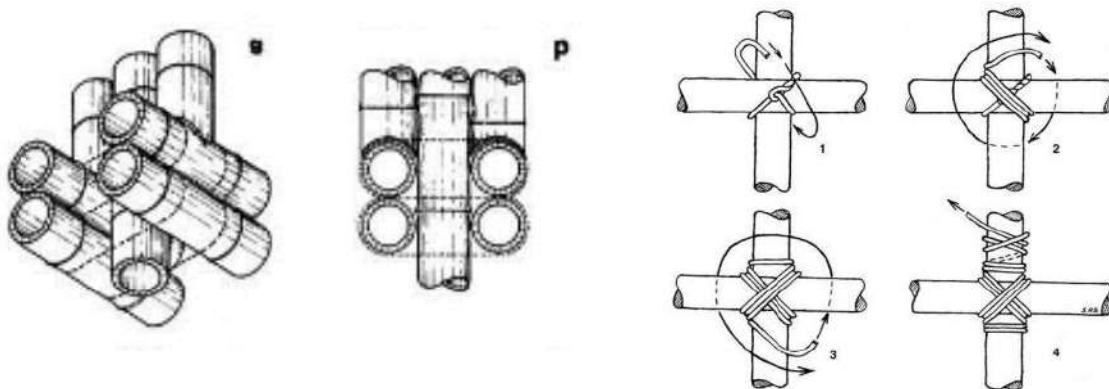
Horizontal and Vertical Lashing joint in Bamboo
